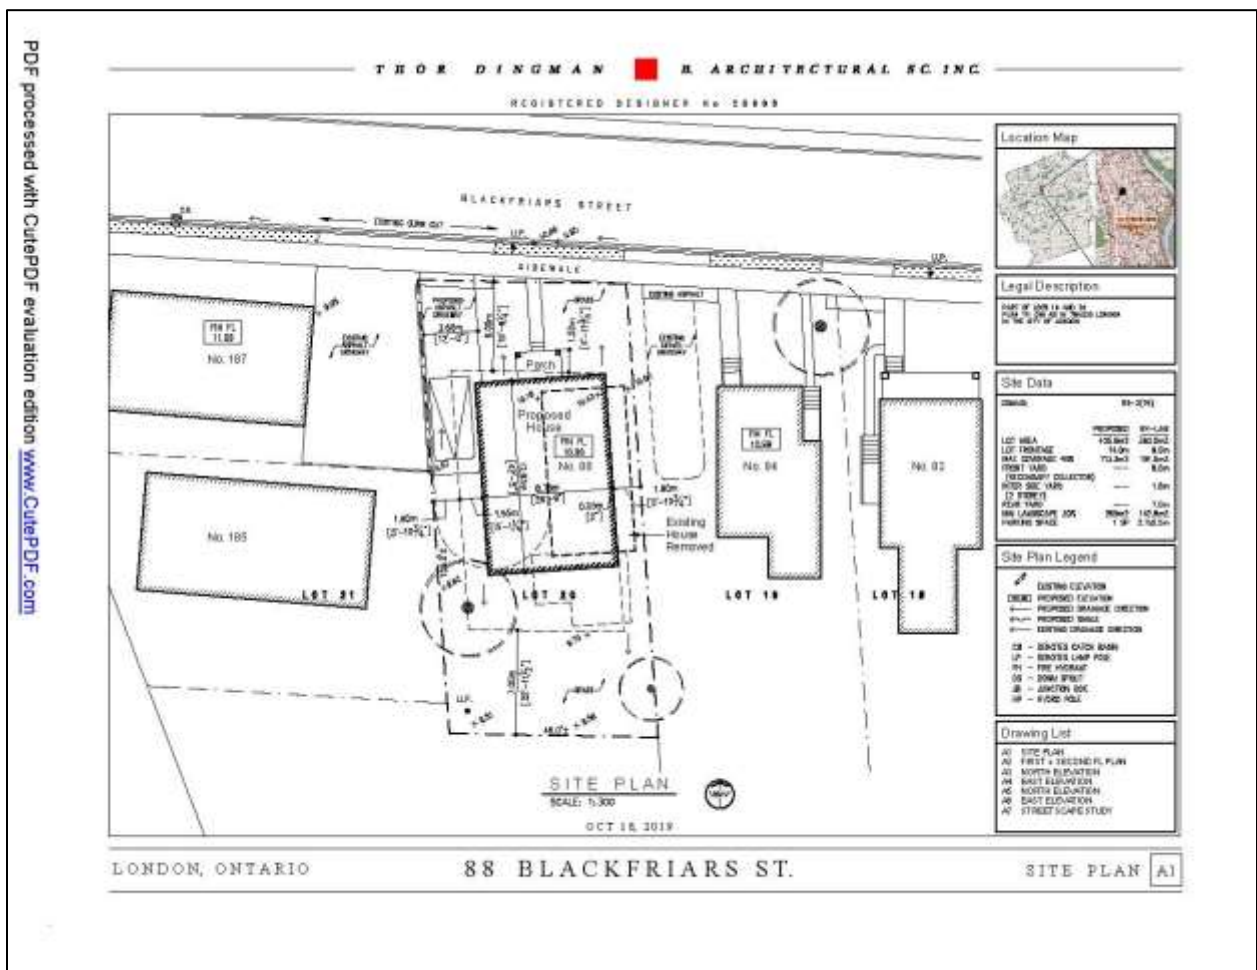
Site plan showing the proposed new building at 88 Blackfriars Street with the setbacks and footprints of adjacent and nearby buildings in the Blackfriars/Petersville Heritage Conservation District.
